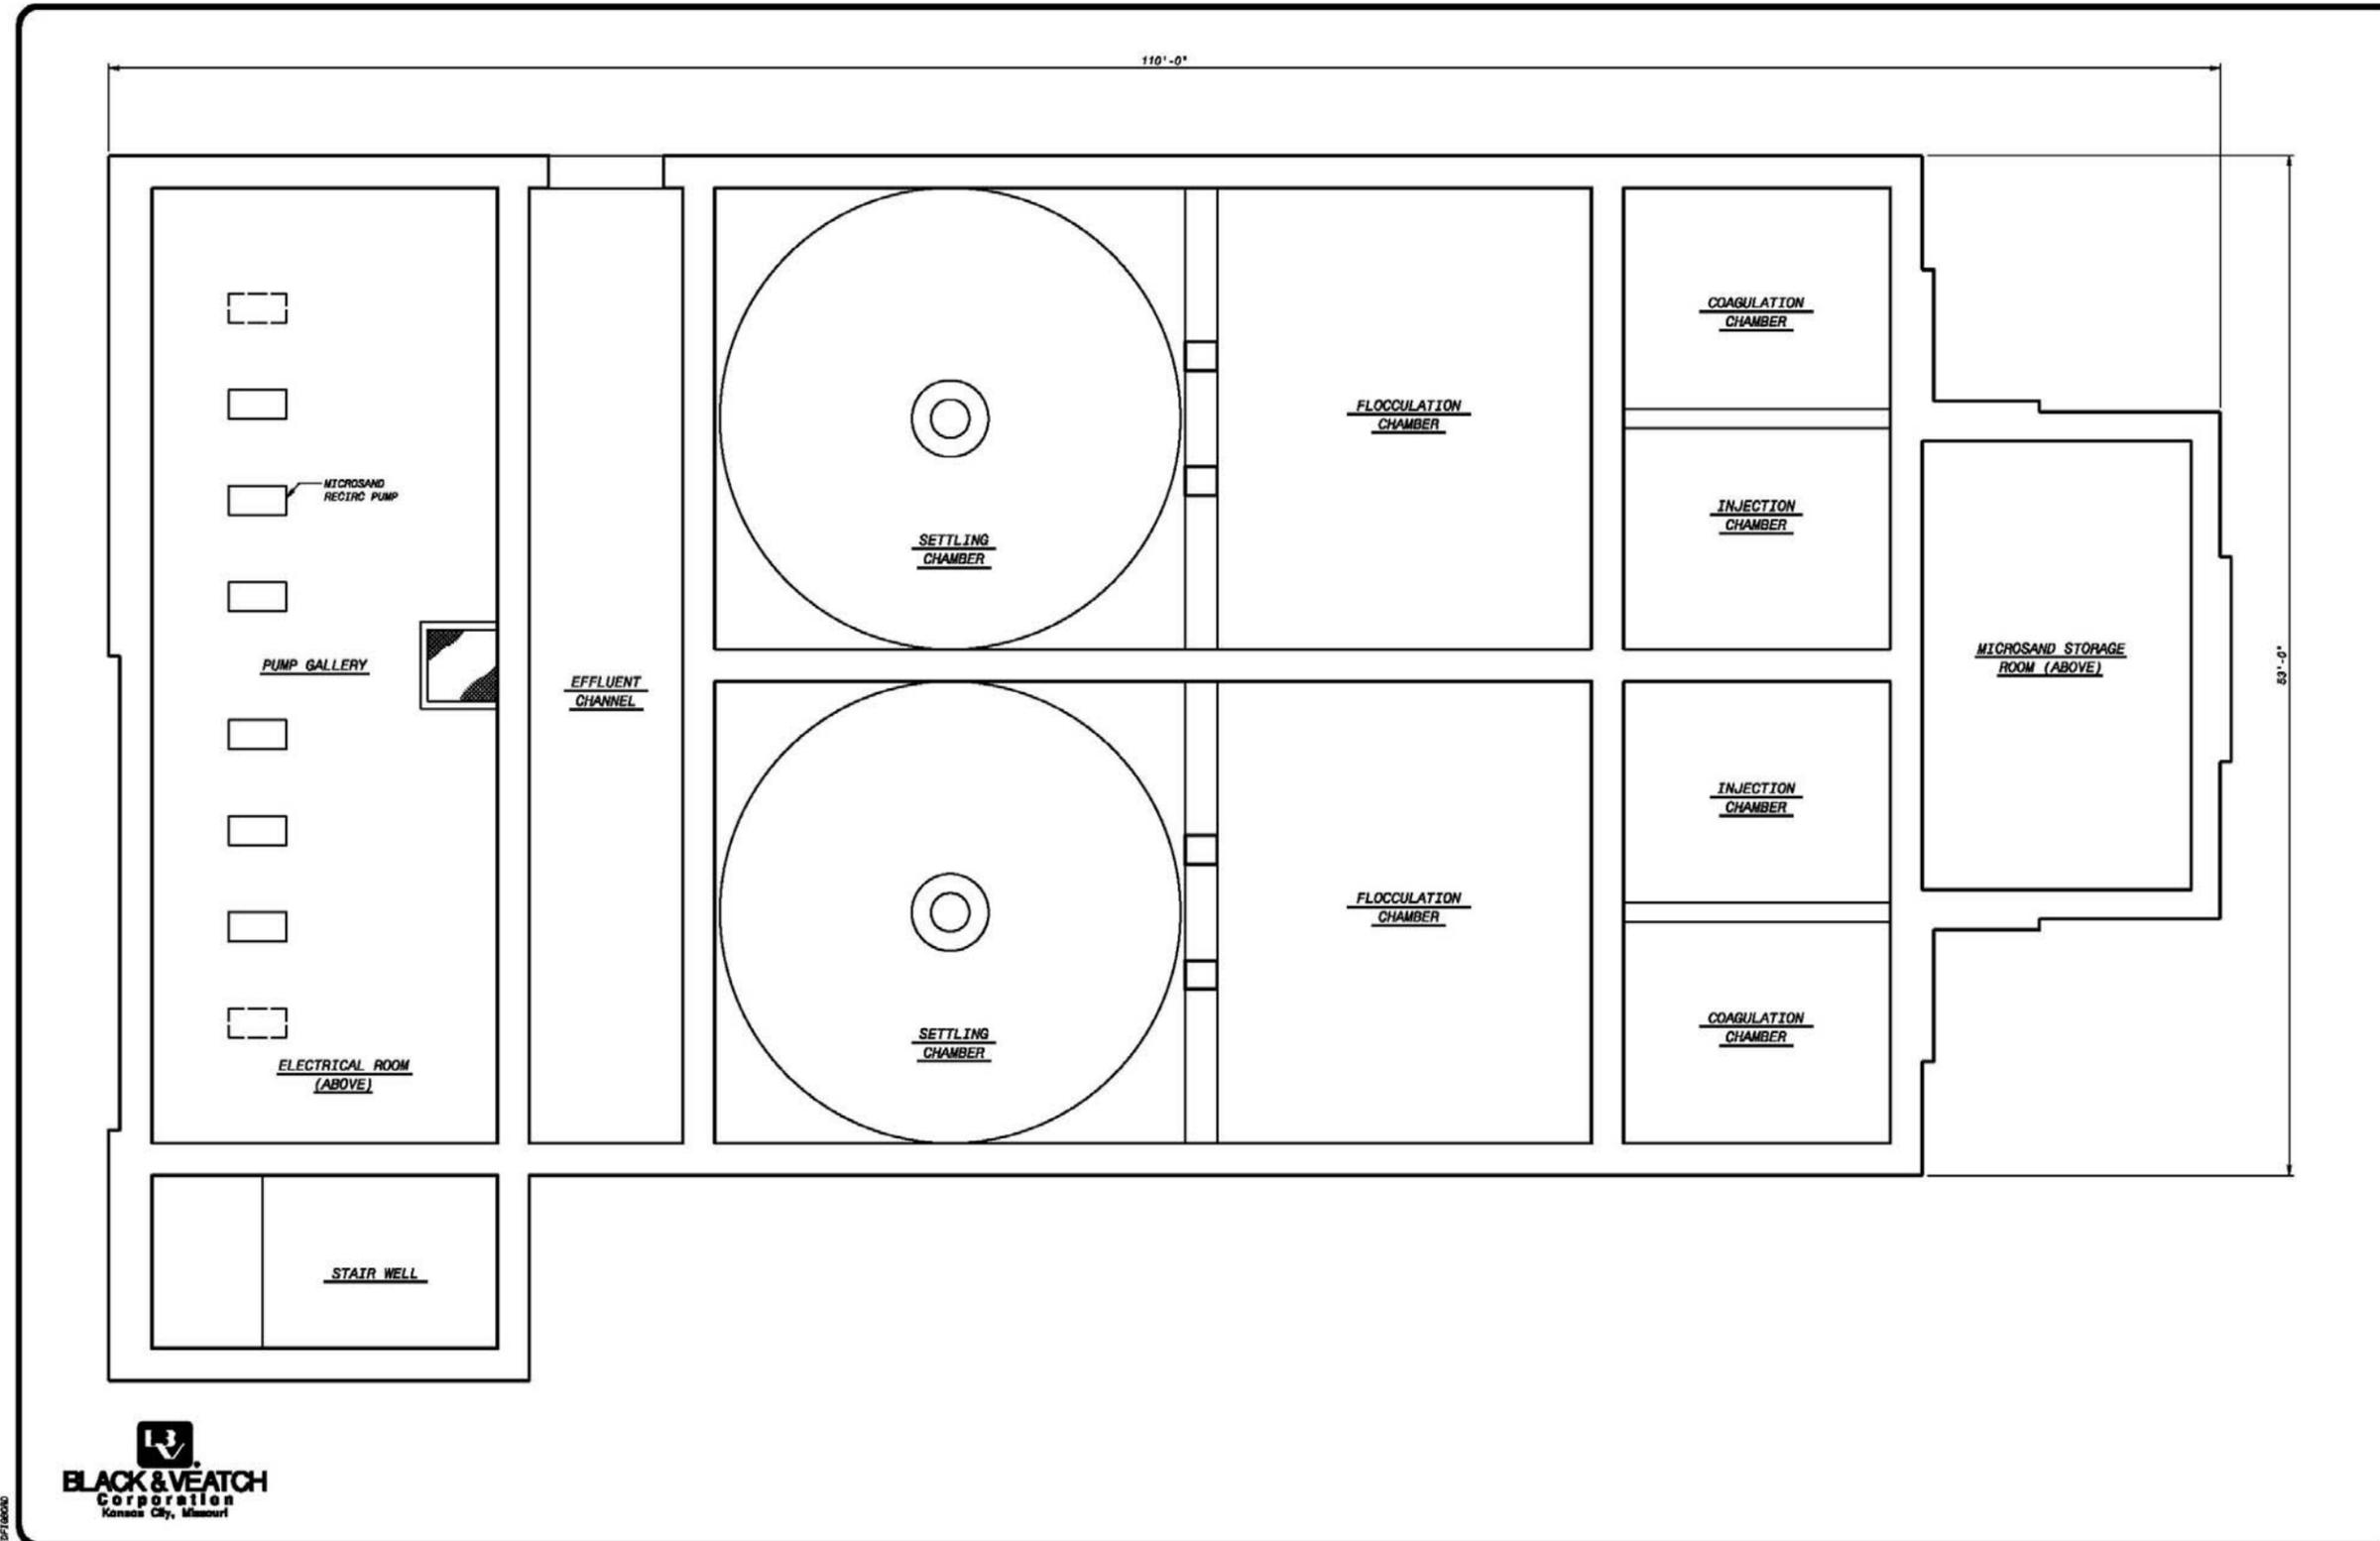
Preliminary Layout of Ballasted Flocculation HRC Facility
